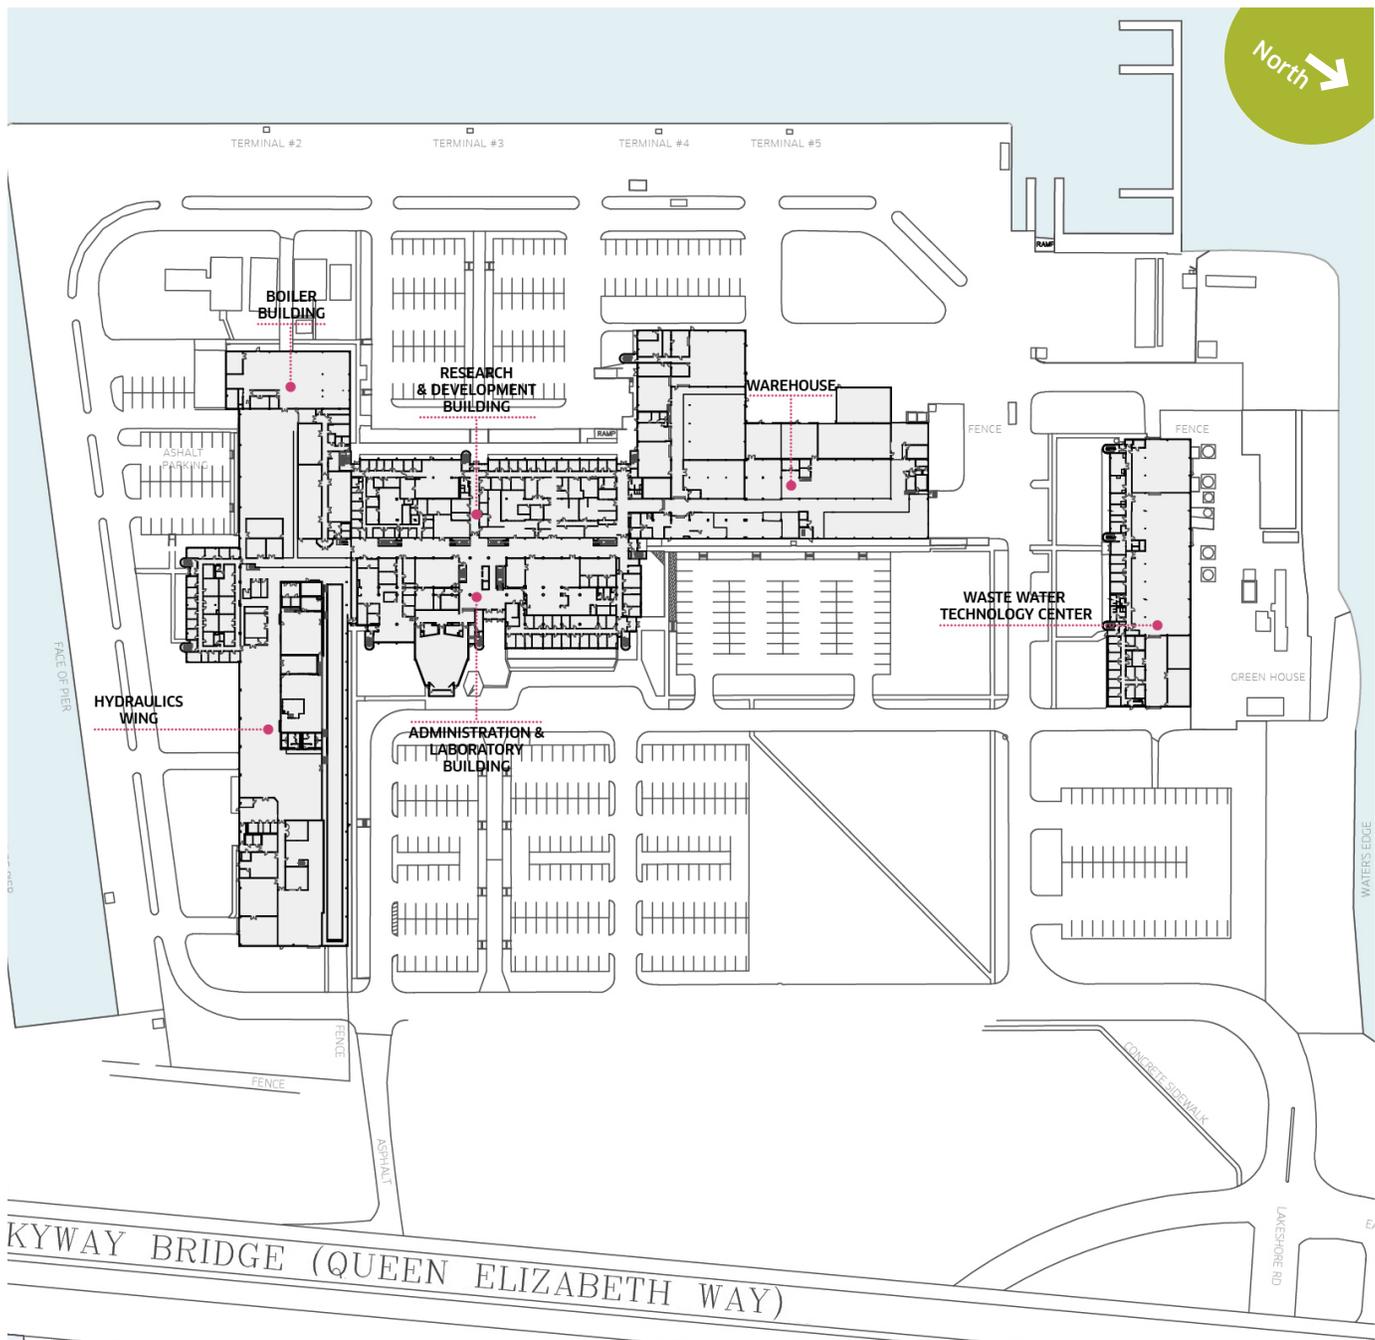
Canada Centre for Inland Waters Site Plan
